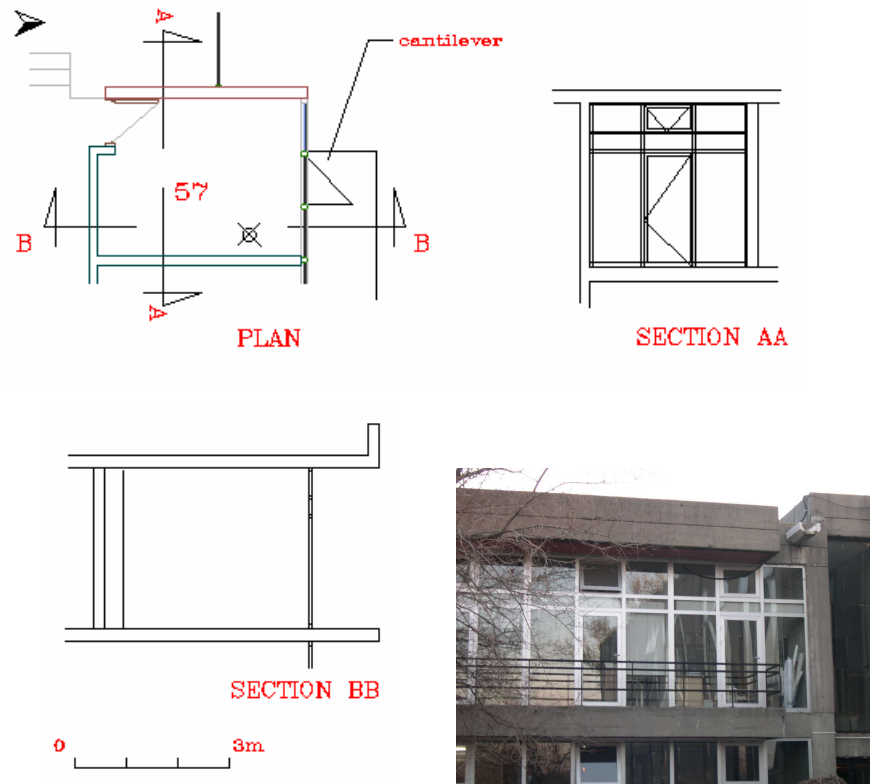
Floor plan, section BB (showing sunshade device), section AA and exterior view of Room57. (photo by the author.)
